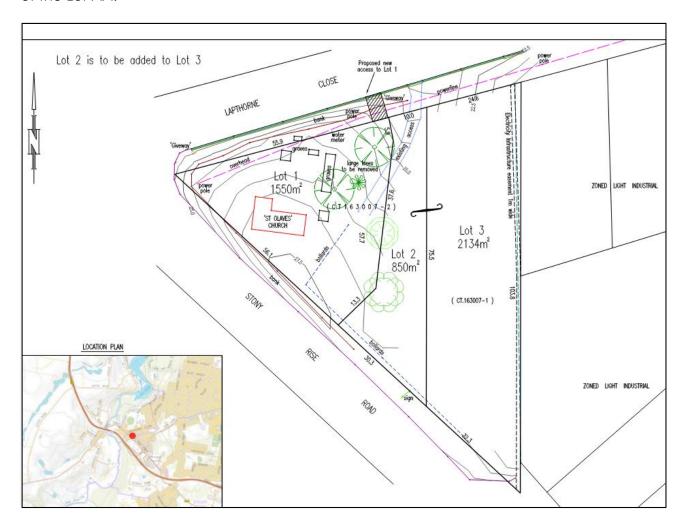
Boundary adjustment plan (Michell Hodgetts Surveyors, 2022)
